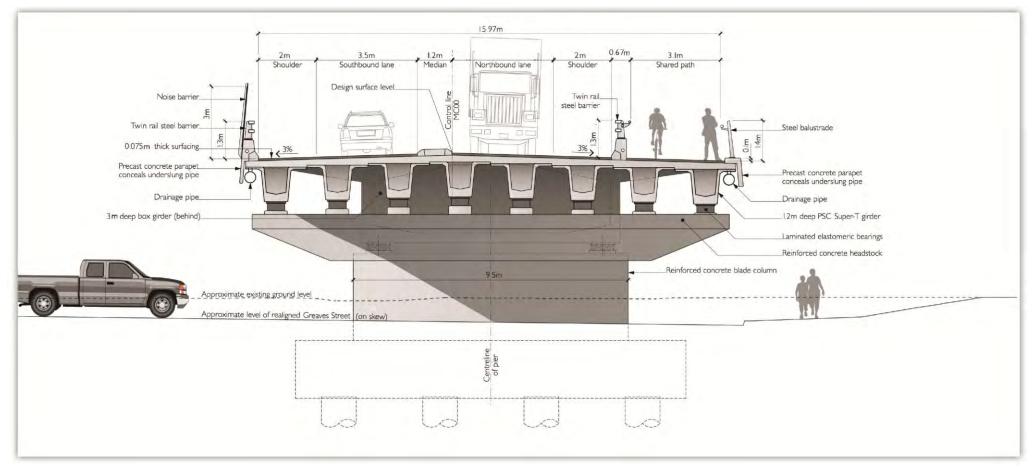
Bridge cross-section 3 (northern end of the bridge)
